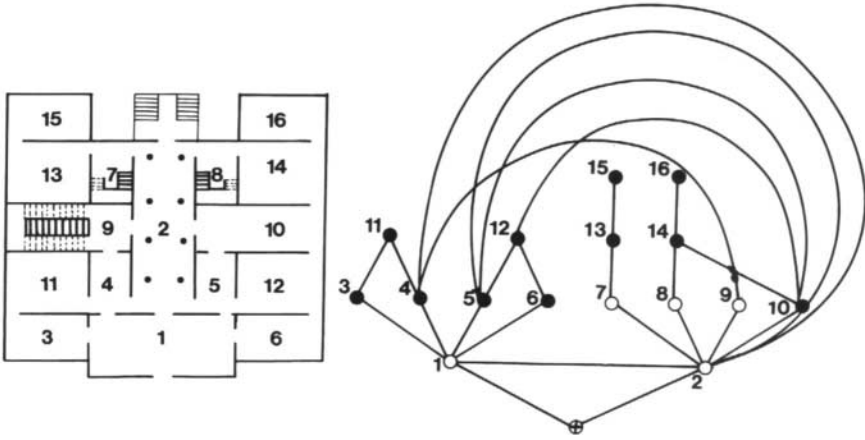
Gunnersbury, outline ground-floor plan and access map. 1 Entrance hall; 2 columned hall; 3, 4, 11 possible closet with parlours or service rooms; 5, 6, 12 possible closet with parlour or sleeping chambers; 7, 8 Secondary stairs; 9 Great stairs; 10 ?Great parlour; 13, 15 possible bedchamber suite; 14, 16 possible bedchamber suite
